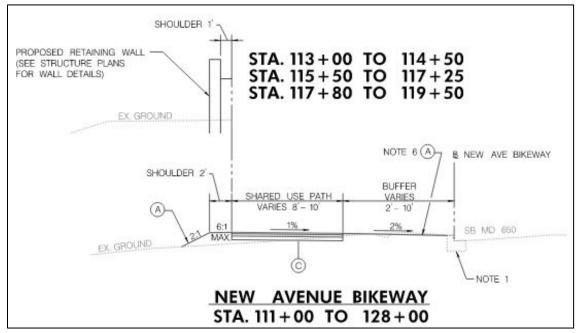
Sidepath Between Sligo Creek Parkway and Larch Avenue – Proposed Cross Section
